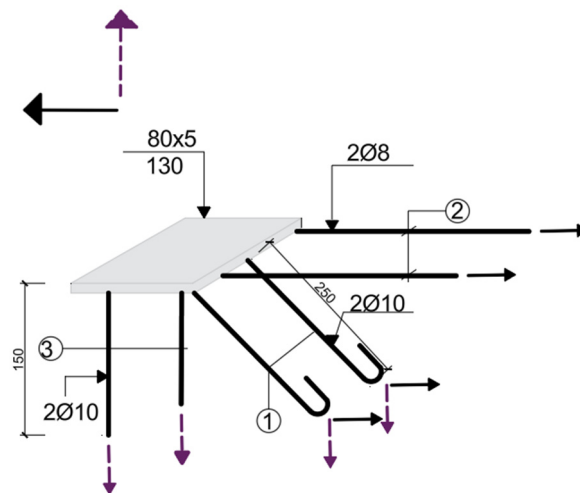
Steel-plate connection (M-4) subjected to horizontal and vertical shear forces resisted through tensile forces in the anchor bars (horizontal and vertical components of forces shown in the diagram; however, welds are not shown) (all dimensions in mm).
